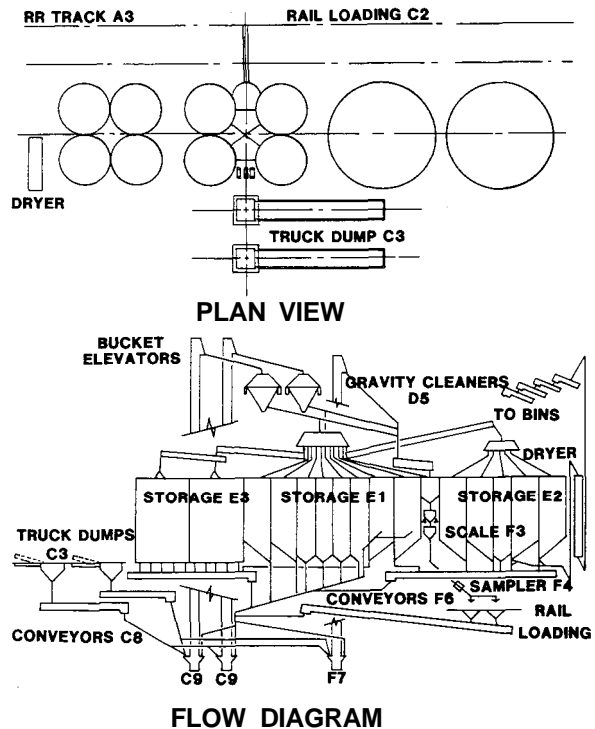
Flow diagram and plan view of 100-car loadout corn-soybean facility.
